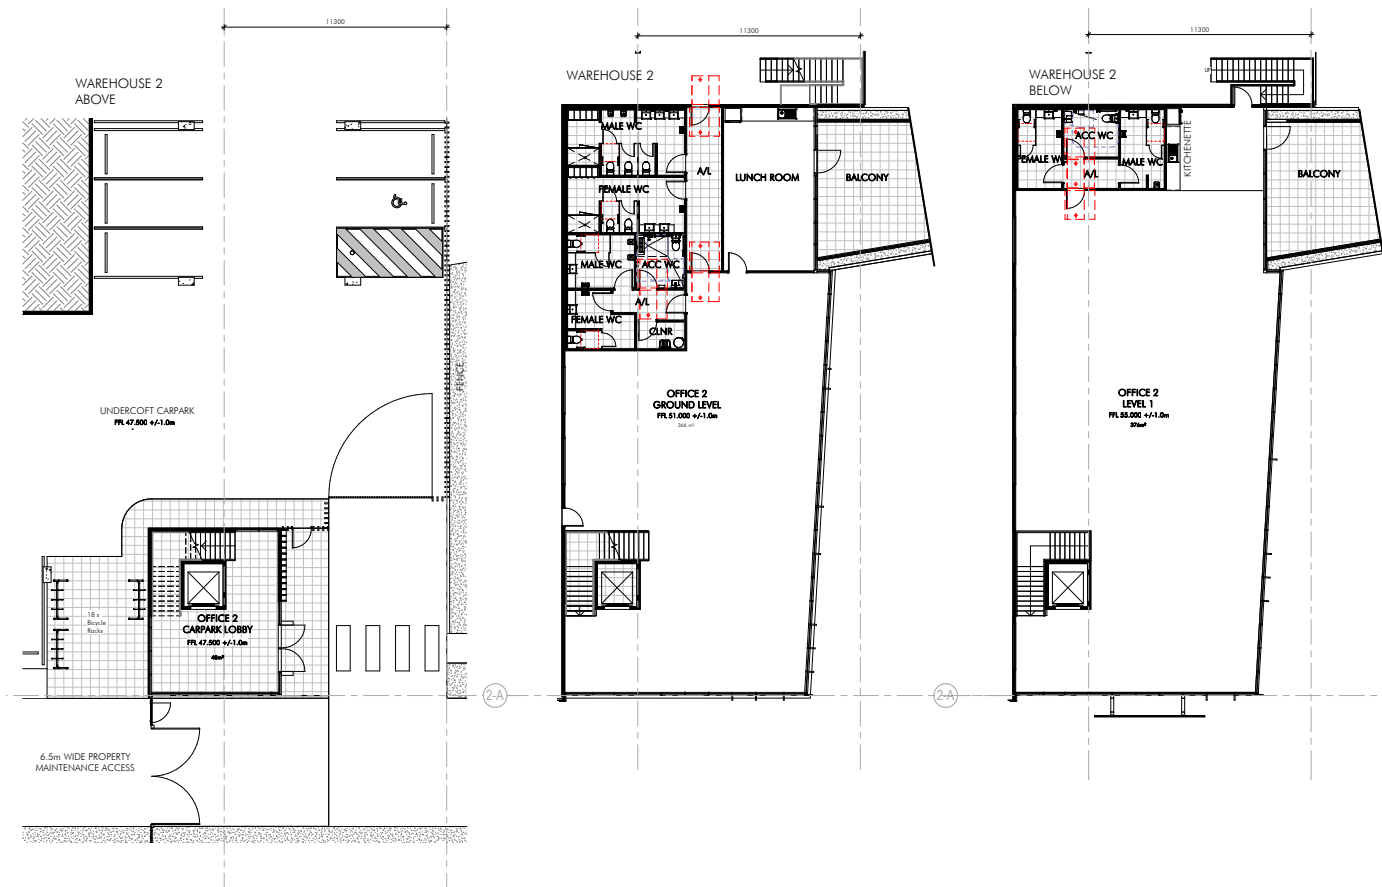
Warehouse 2 – Office 2 Floor Plans
